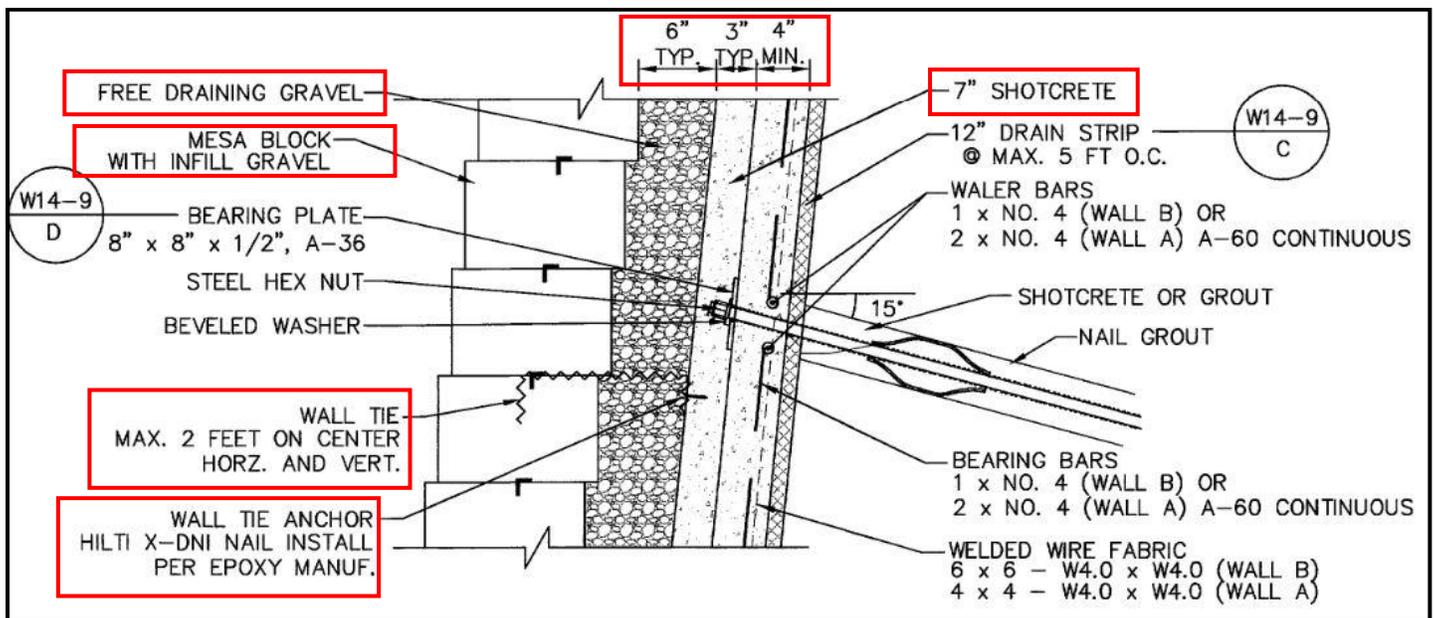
Excerpt from sheet W14-9 from Ground Engineering design drawings showing soil nail wall cross section; notated with red rectangles to highlight areas discussed above
